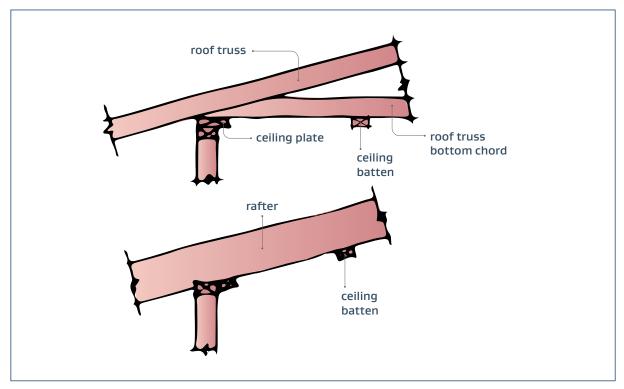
Ceiling battens on the bottom chords of roof trusses and on ceiling joists (of couple-close roofs) and on the undersides of rafters
